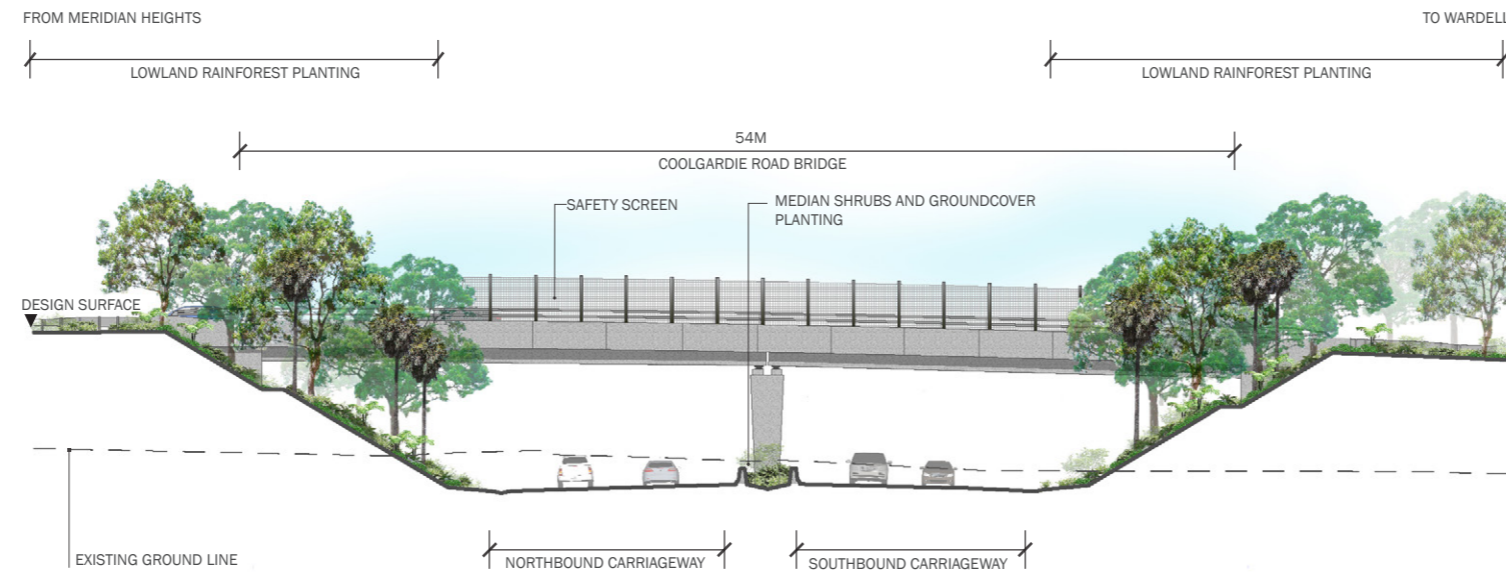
Coolgardie overpass - elevation (Scale 1:400)
